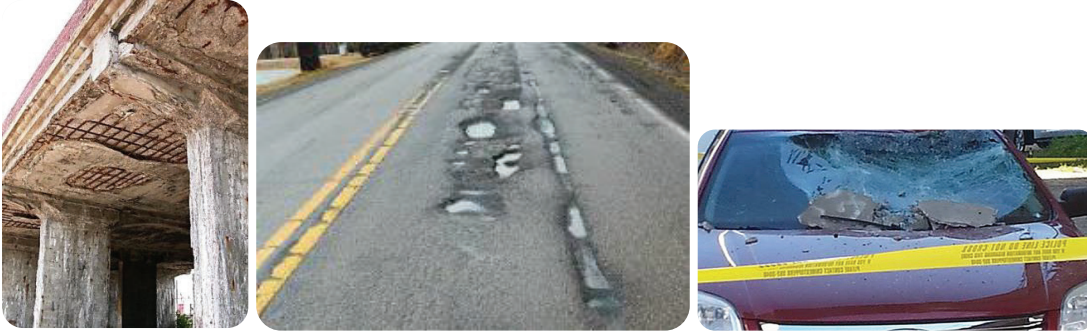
Deteriorated bridges and roads and a car damaged by falling concrete from deteriorated bridge.
